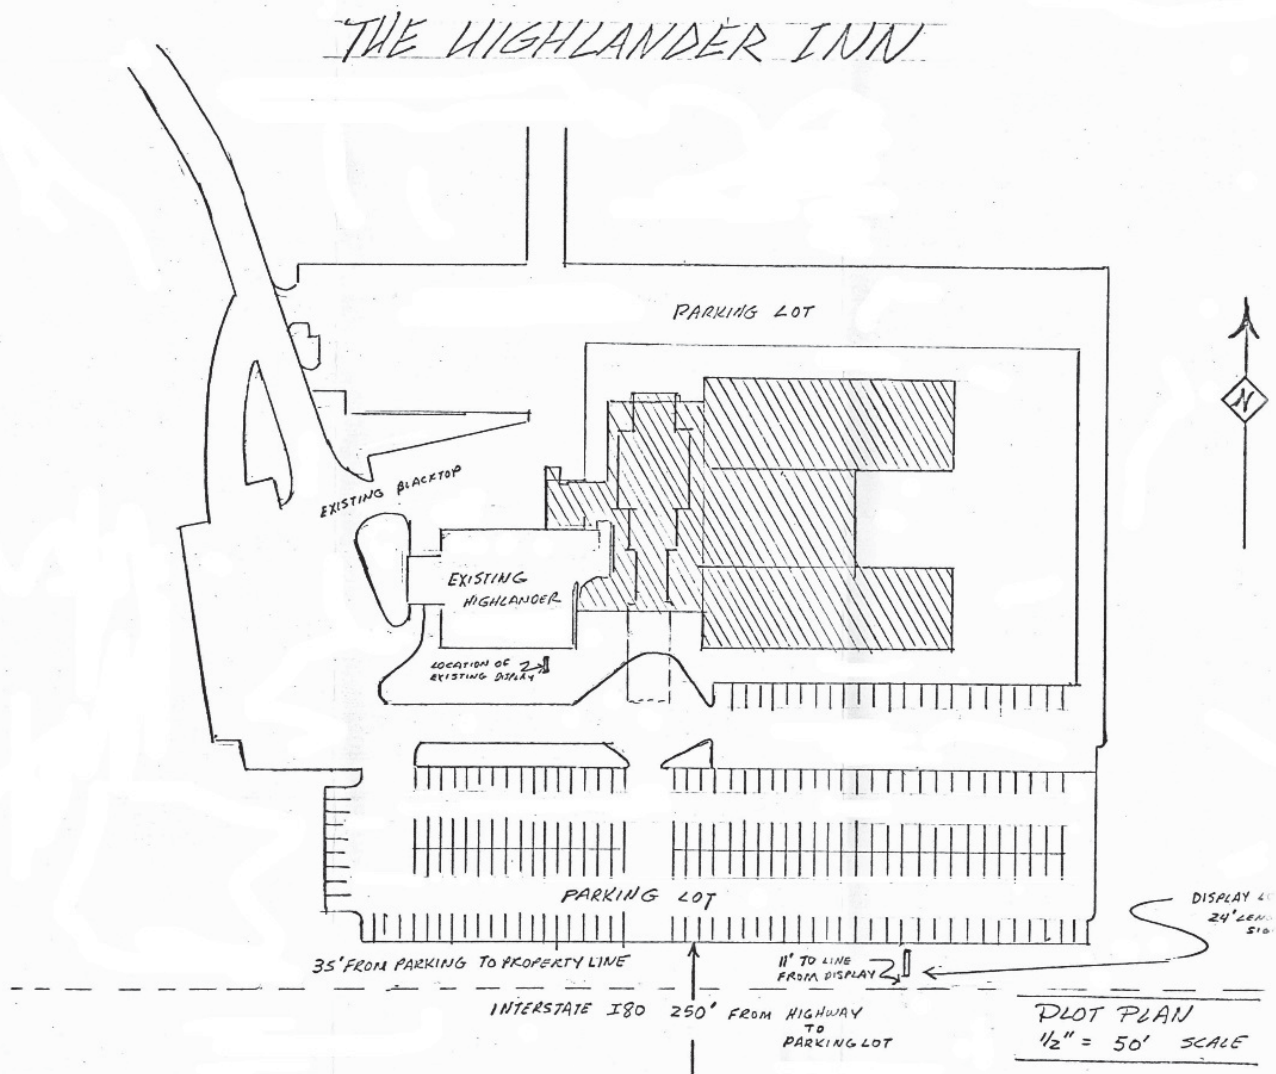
June 1973 site plan and proposed sign relocation (Courtesy of Sheila Boyd)
